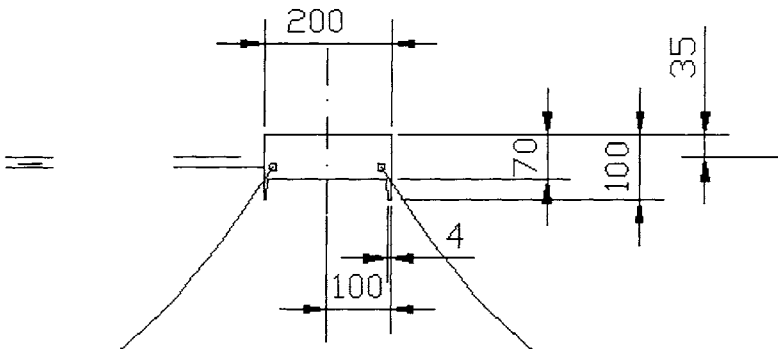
Cross section of the tested breakwater (dimensions in mm).
